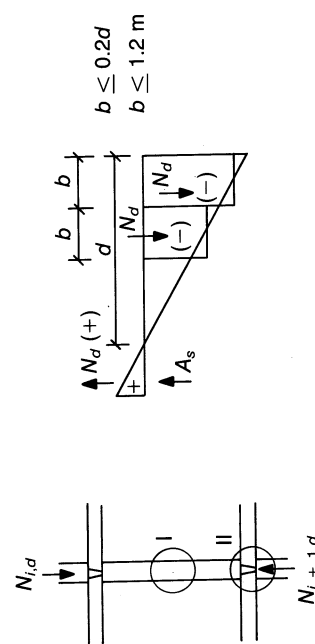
Wall subject to normal forces and in-plane bending
